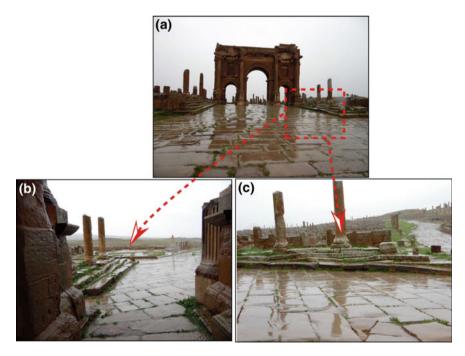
Folded steps on stairs on the path to the Arche of Trajan at Thamugadi site
